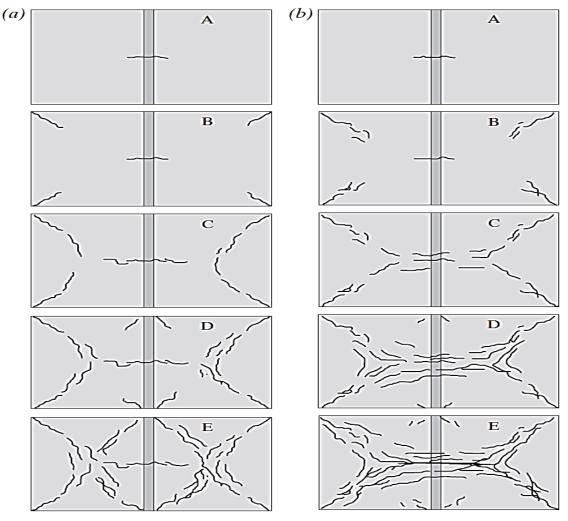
The crack pattern that developed in (a) an SFRC slab specimen (b) an RC slab specimen, by Singh [28].
